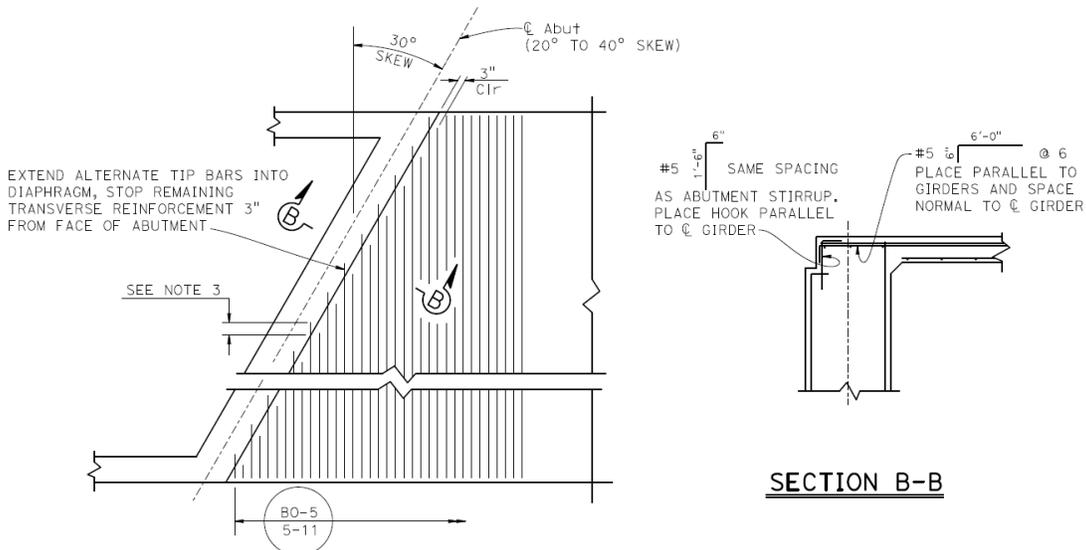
Transverse Deck Reinforcement Details at Abutment (20° to 40° Skew)
